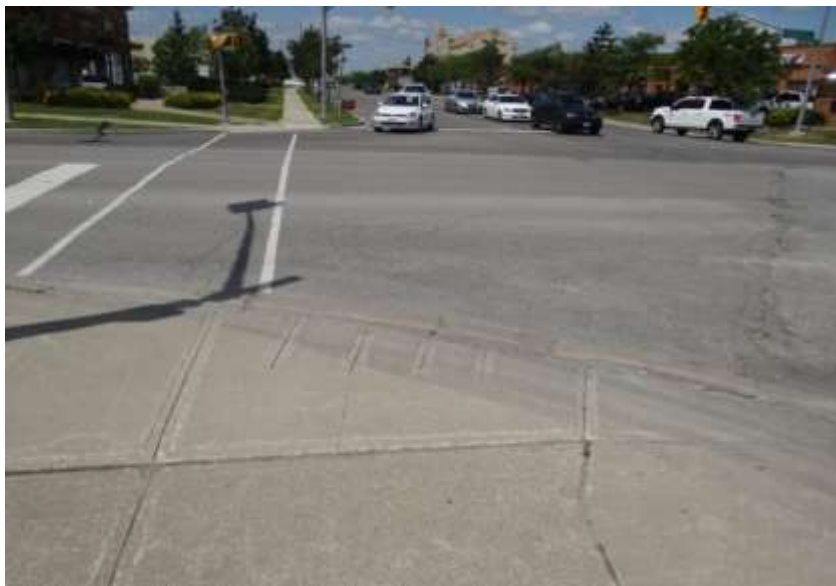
Tactile Surface at Curb Ramps not aligned with Crosswalks
